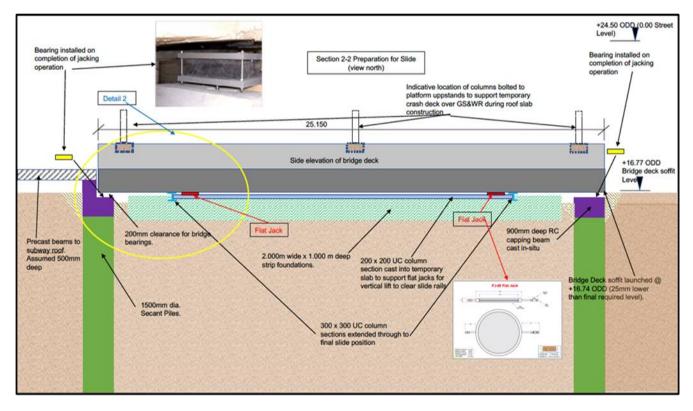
Housing for Temporary Columns for Crash Deck in the Bridge Deck
